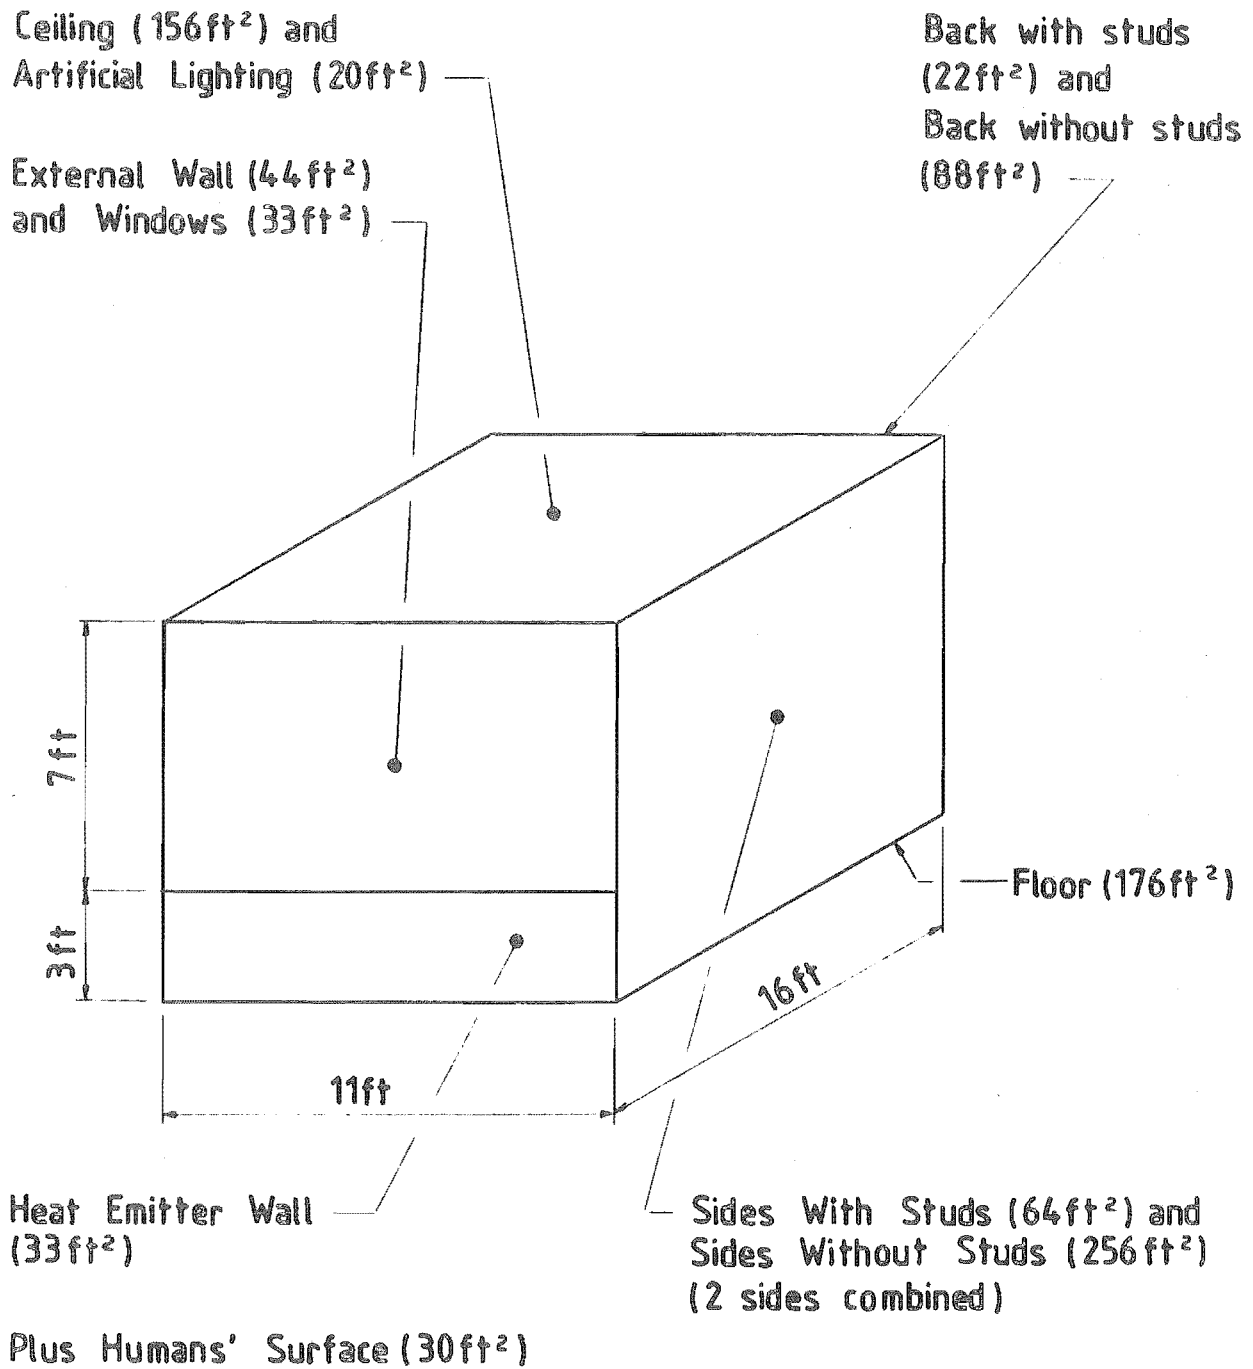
GEOMETRIC LAYOUT OF ROOM 1
